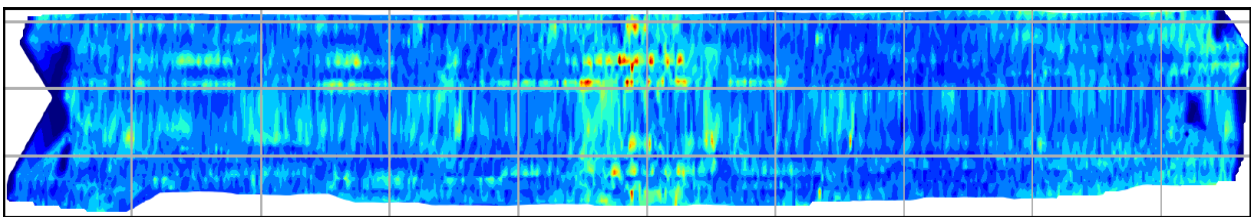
GPR Images Showing Bellow Top Steel Condition of Bridge Deck No. 22266
